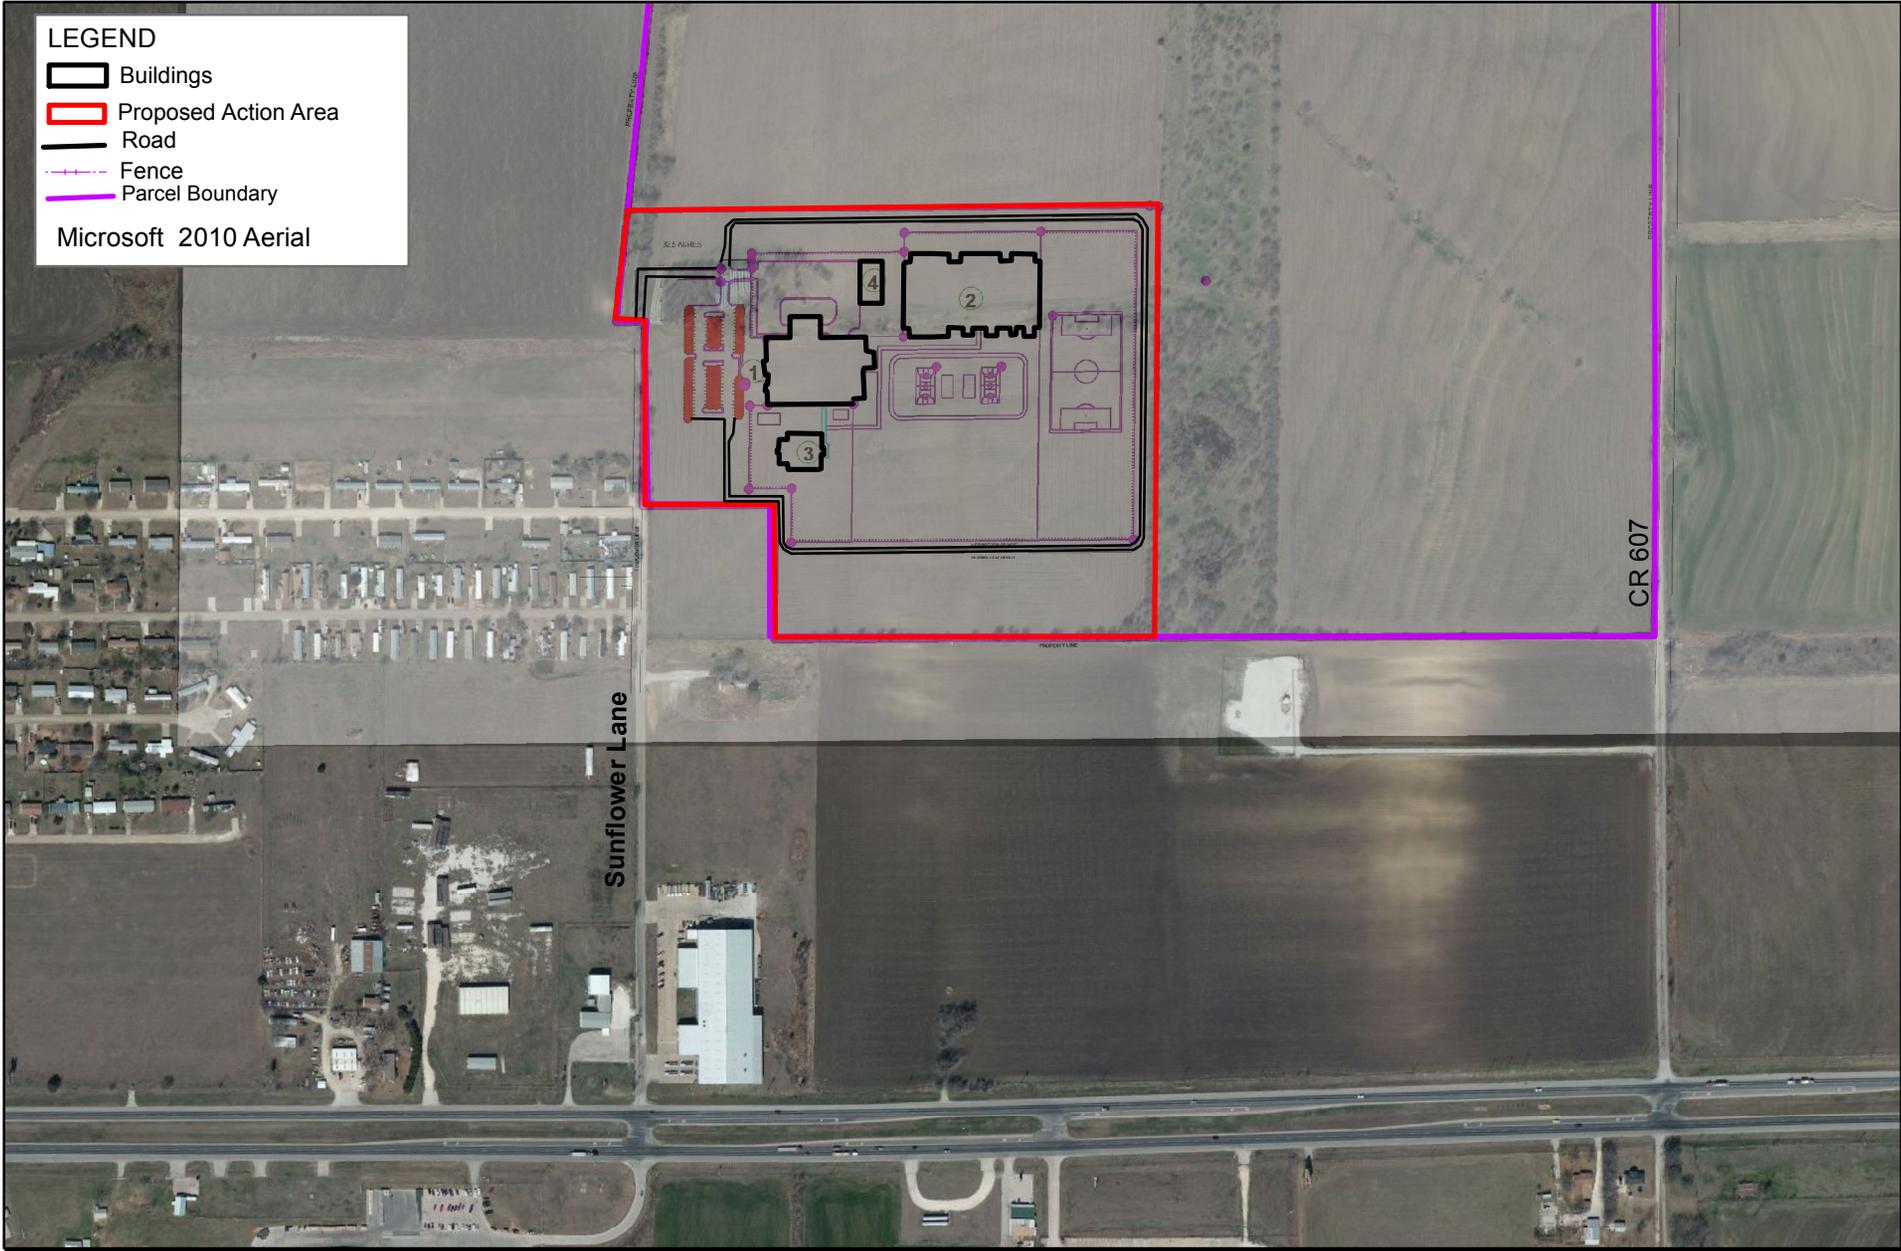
Detailed Plan View of the ICE Alvarado Processing Center
